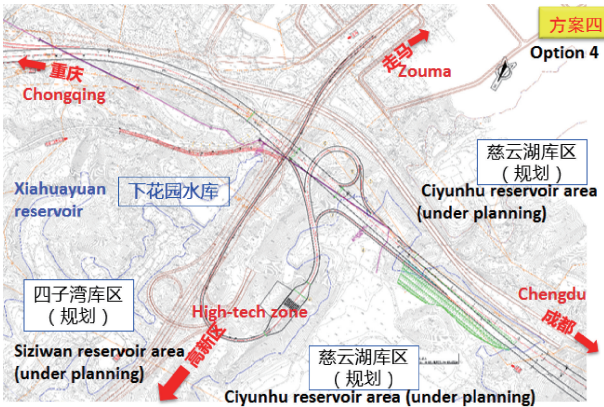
Layout plan of K-line Zouma Interchange (Option 4)
